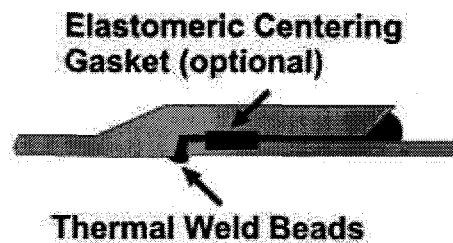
Bell & Spigot Pipe End Jointing with Additional Weld Beads
